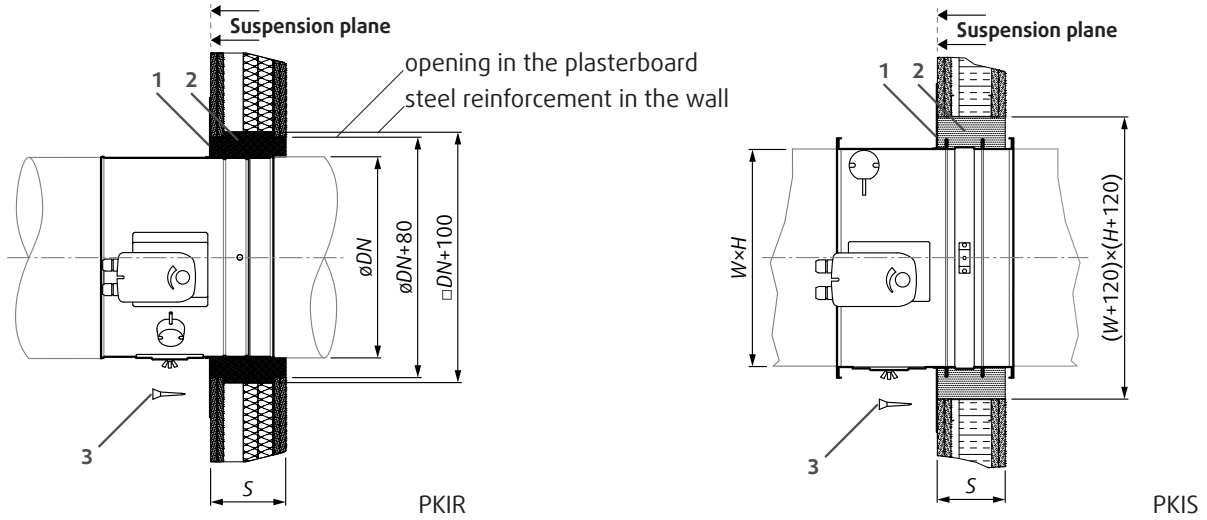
Wet installation of the round and square fire damper using plaster mixture by mortar or concrete.
